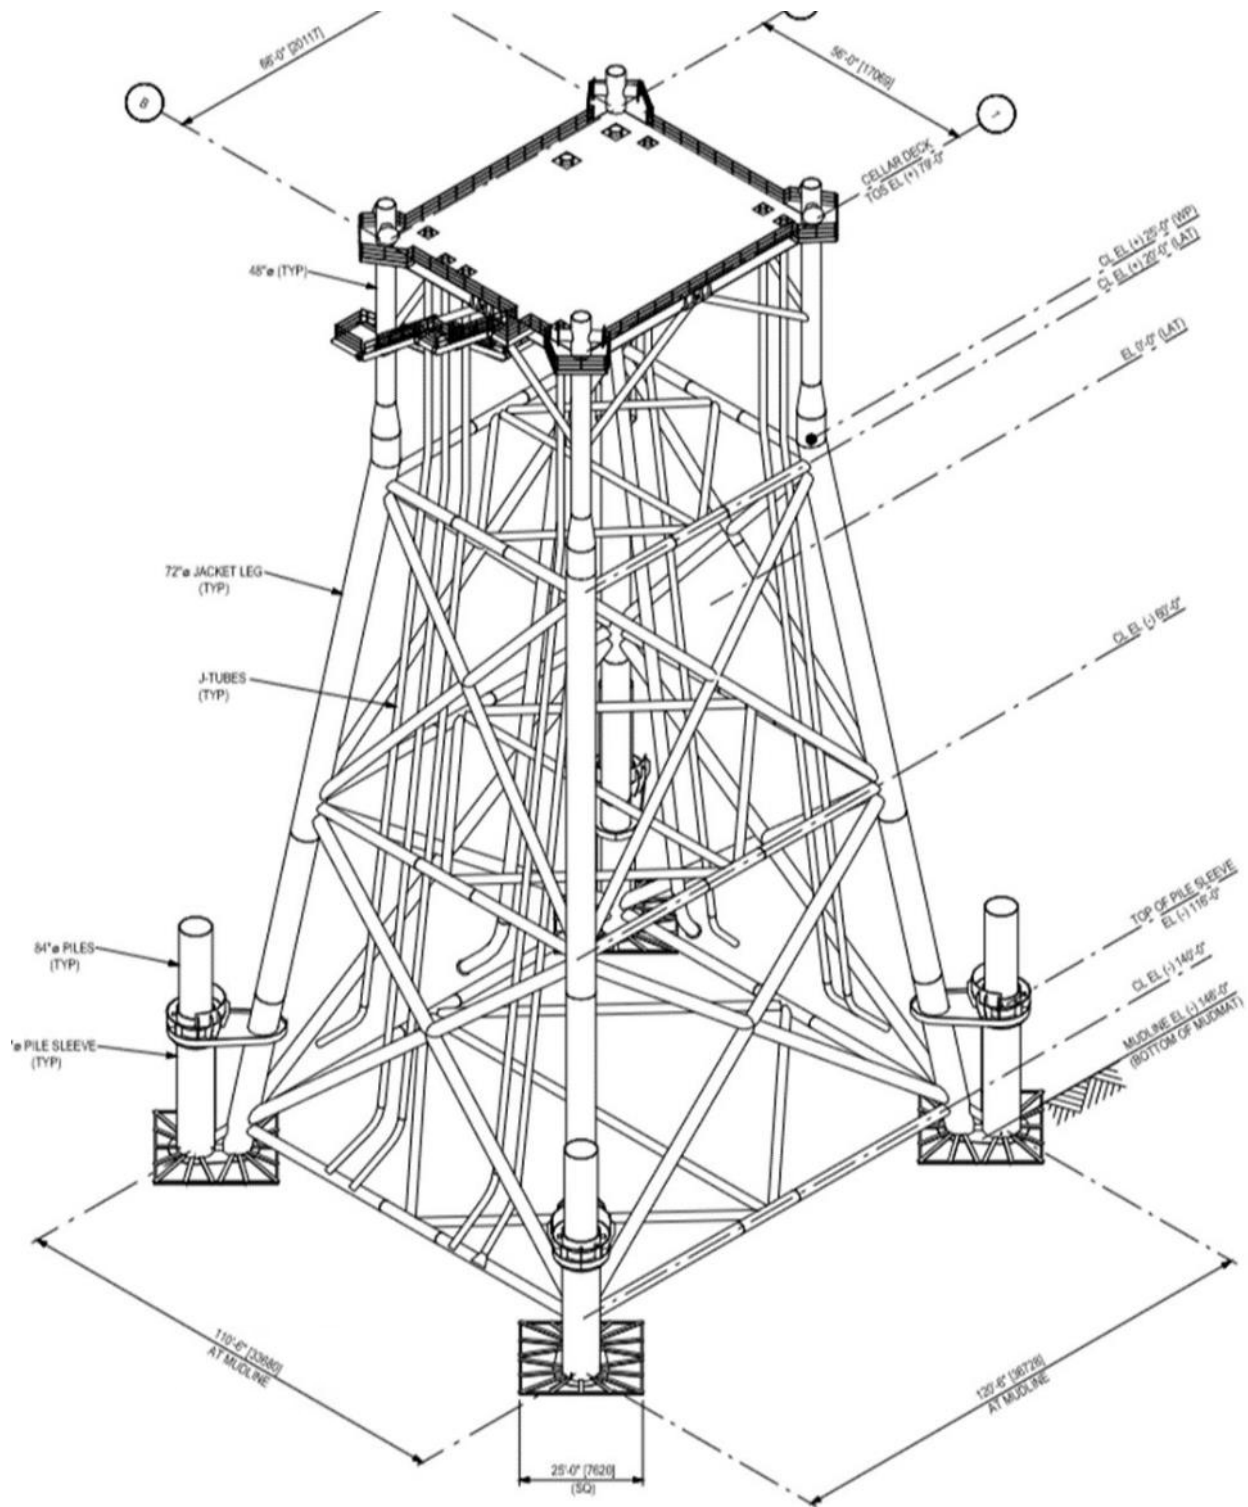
Conceptual Piled Jacket Foundation
